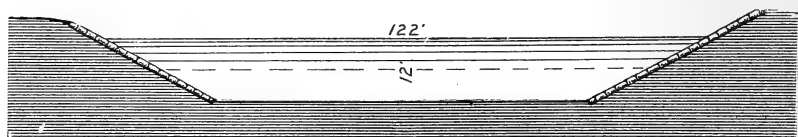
Earth section of Barge canal recommended by Canal Committee. Width of bottom of canal 75 feet.
